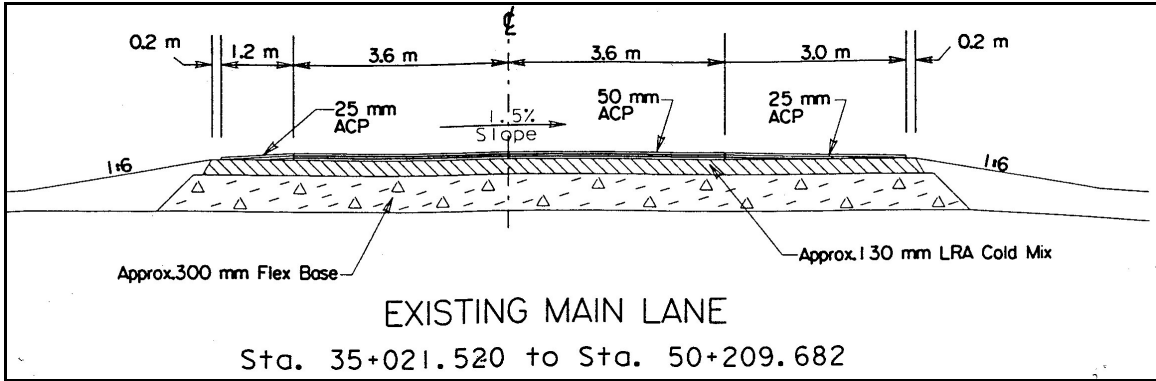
Existing South Typical Section of IH 35 in Laredo District.
